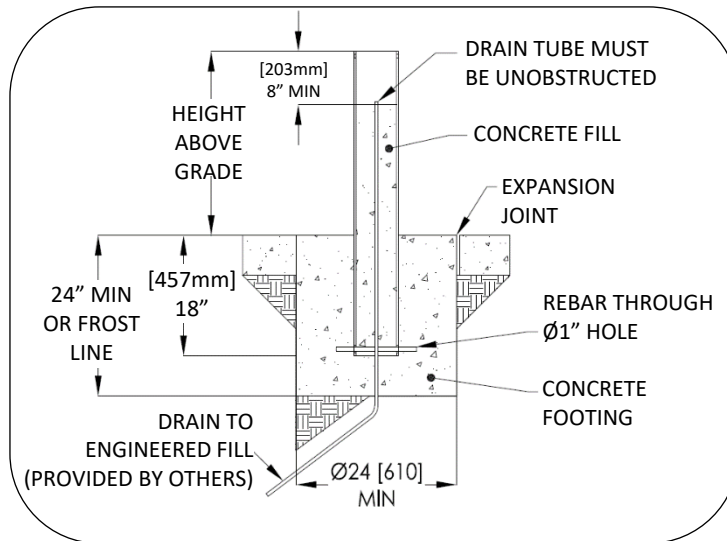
ALT FOOTING FOR EMBEDDED BOLLARD WITH INTERNAL CONCRETE FOR MINIMUM SECURITY
